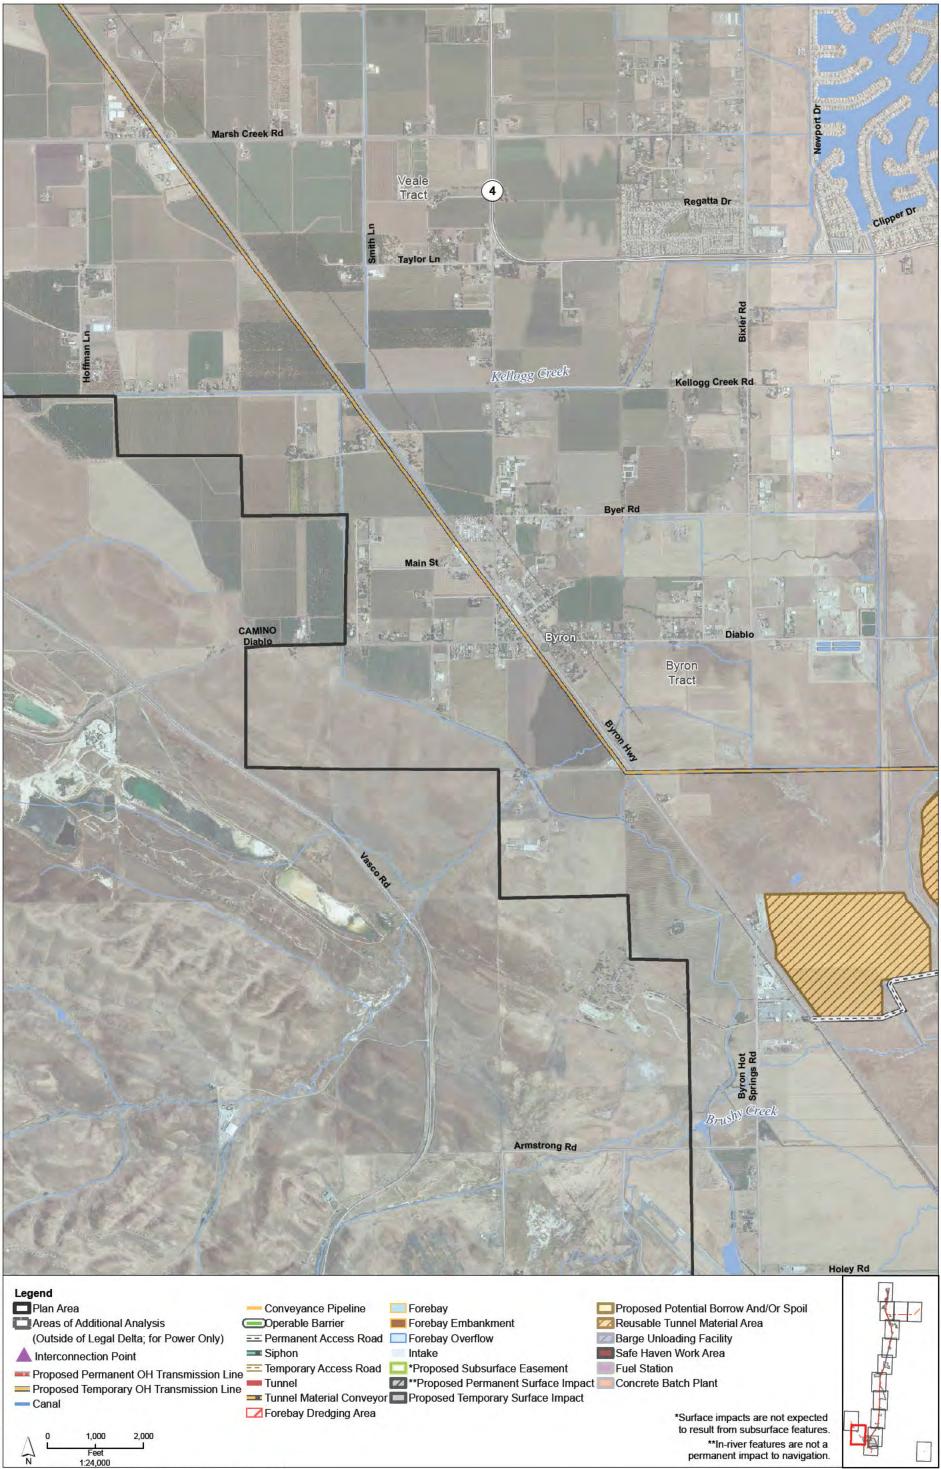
Sheet 11 of 15 Modified Pipeline/Tunnel Alignment (Alternative 4)
